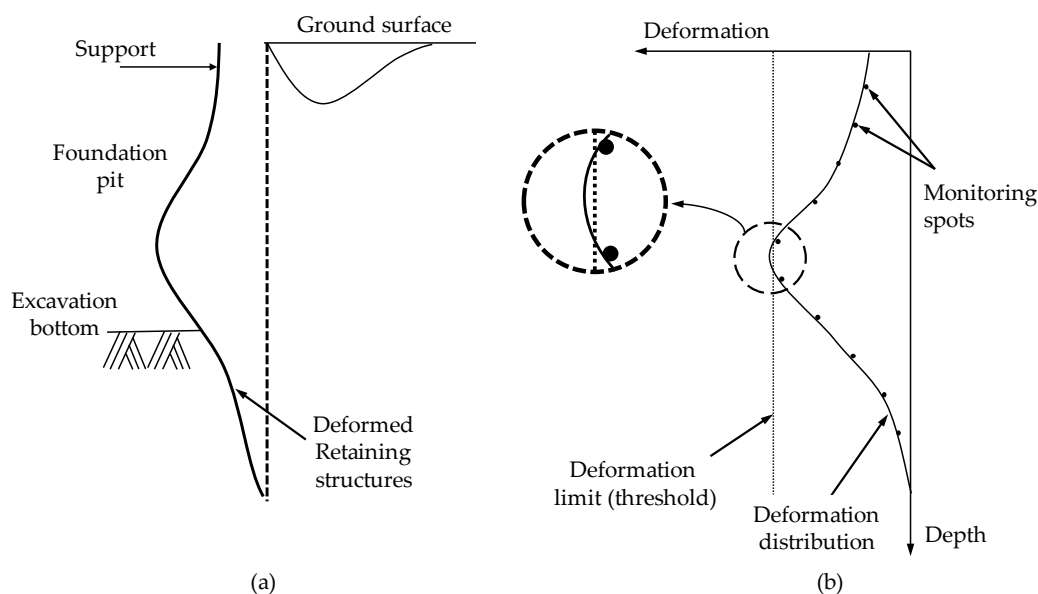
Illustration of deformed retaining structures in foundation pits. (a) Vertical deformation. (b) Failure occurring at unmonitored locations.
